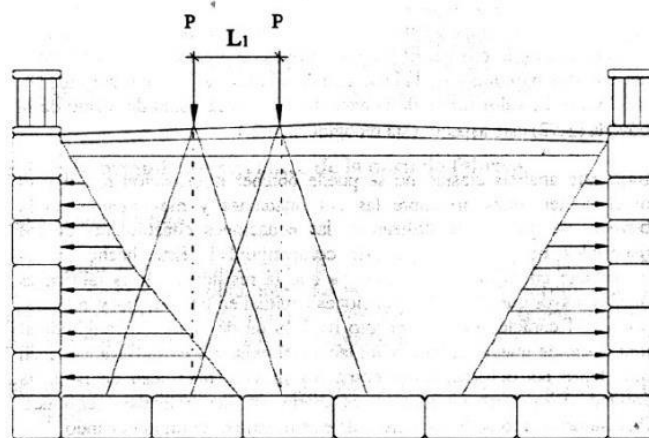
Cross section of a masonry arch bridge showing the lateral force acting from the infill to the spandrel walls. [8]
